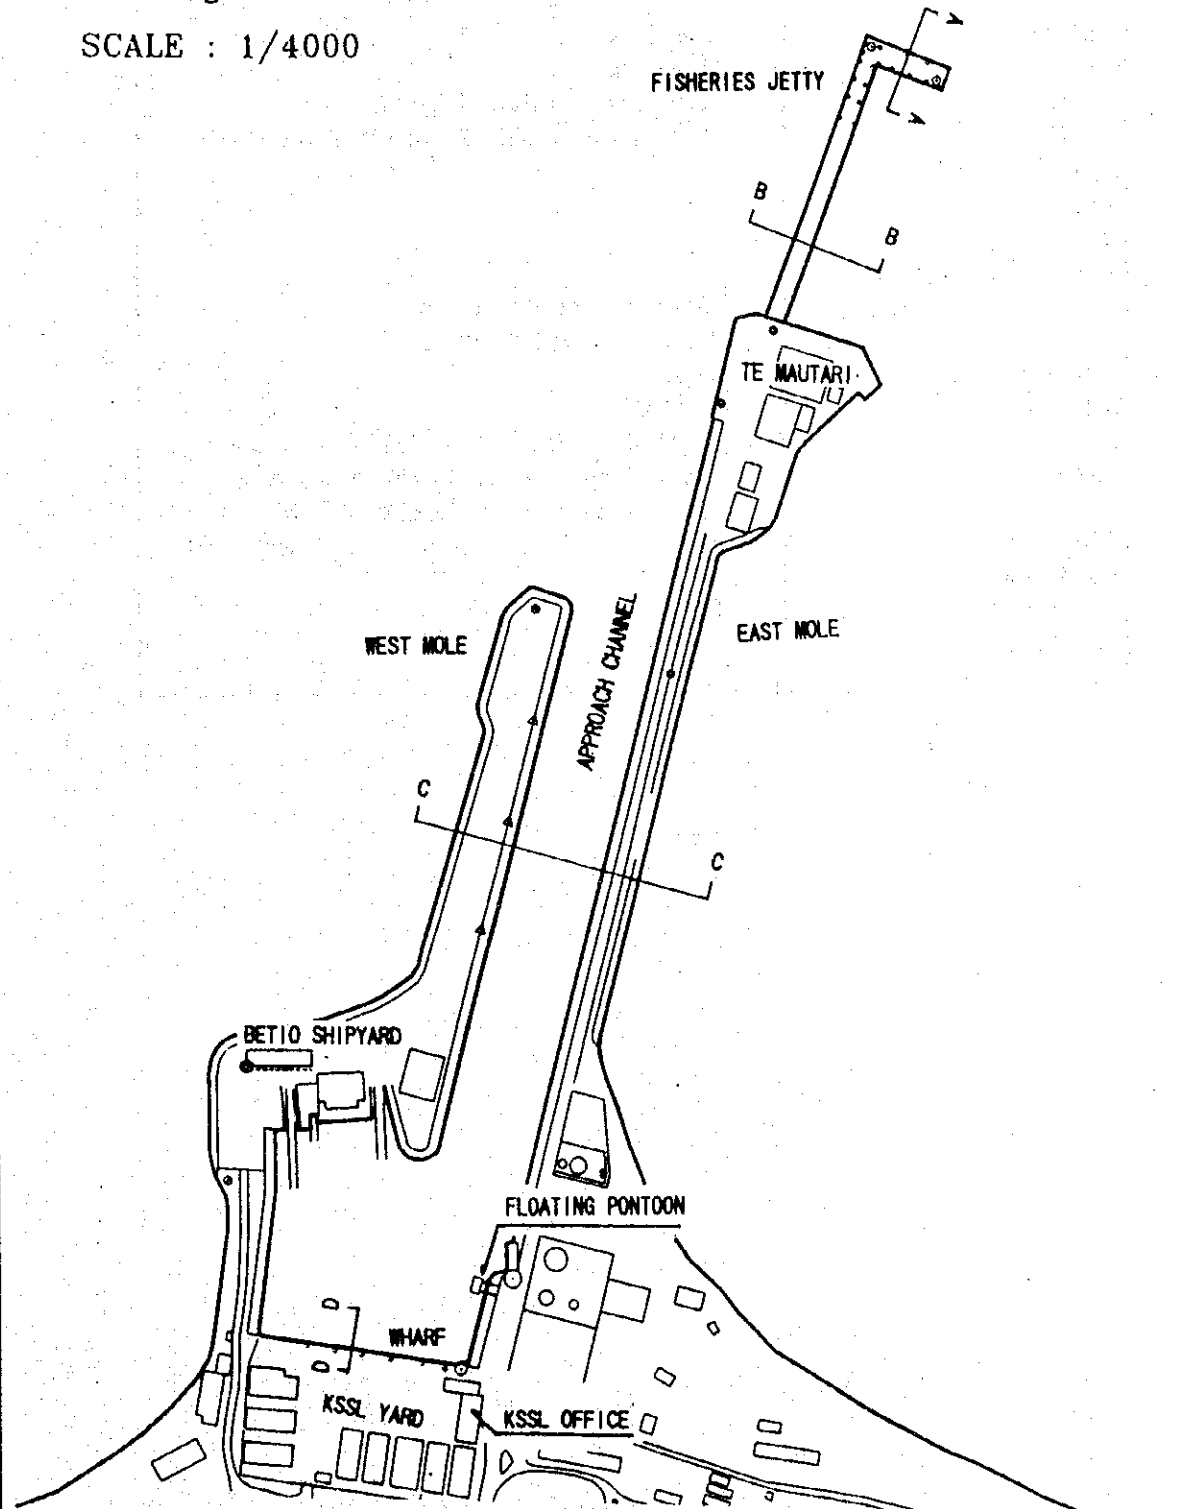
Outline of Existing Facilities in Betio Port
